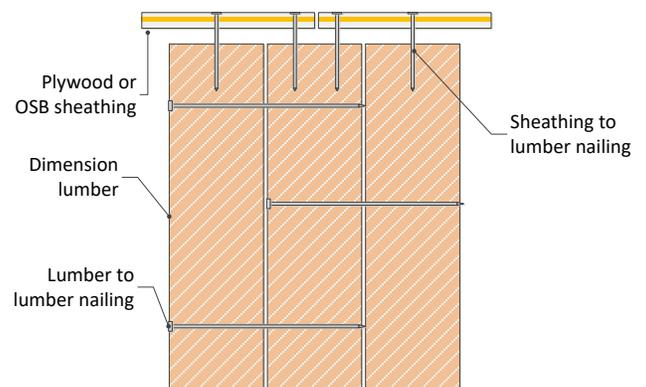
Nail-laminated timber made by mechanically fastening dimension lumber stacked on edge, covered with structural sheathing.
